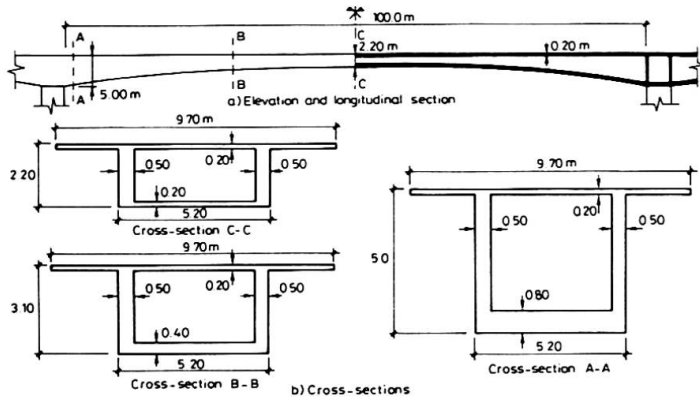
Elevation and longitudinal section of the bridge. Cross-sections.
